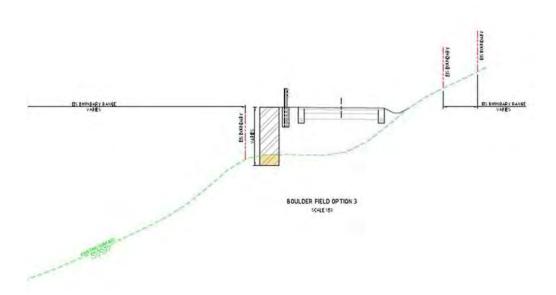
Indicative cross-section of construction in rock stream area on Lobs Hole Ravine Road
